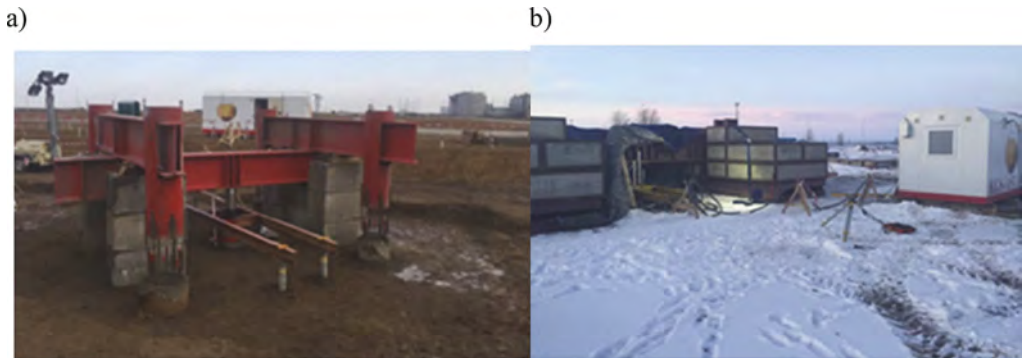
Field pile test by SLT (ASTM): (a) anchors pile system and (b) loading platform system.
